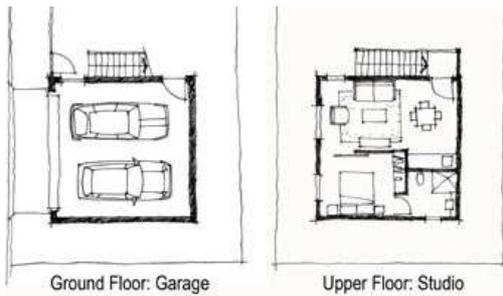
Indicative example of a secondary dwelling above a garage (Type 1 not strata subdivided)
